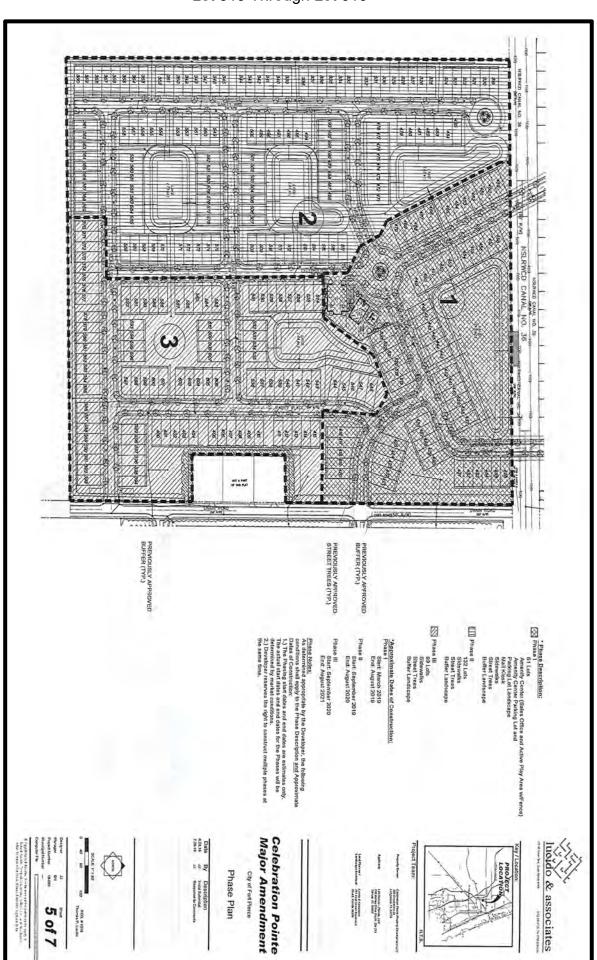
EXHIBIT A Sheet A5 Major Modification to Planned Development Lot 319 Through Lot 610
